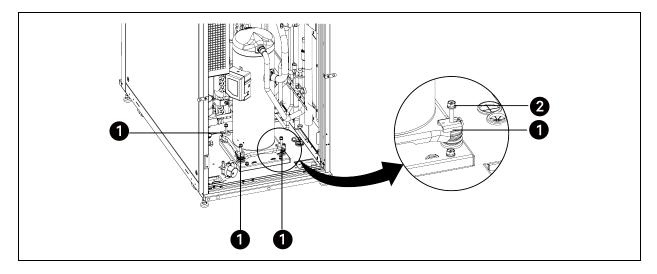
Removing Compressor Fixing Plates for CRD25
